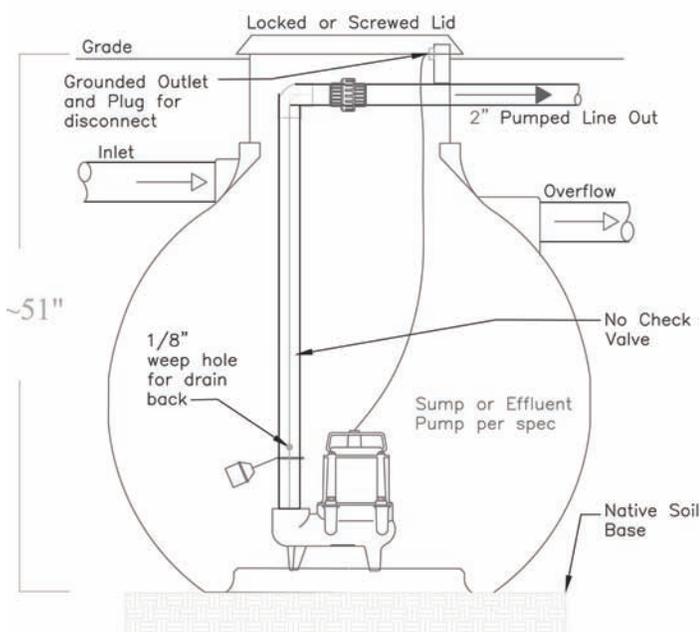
A pump tank can be used to pump water into a system's main water storage tank.
